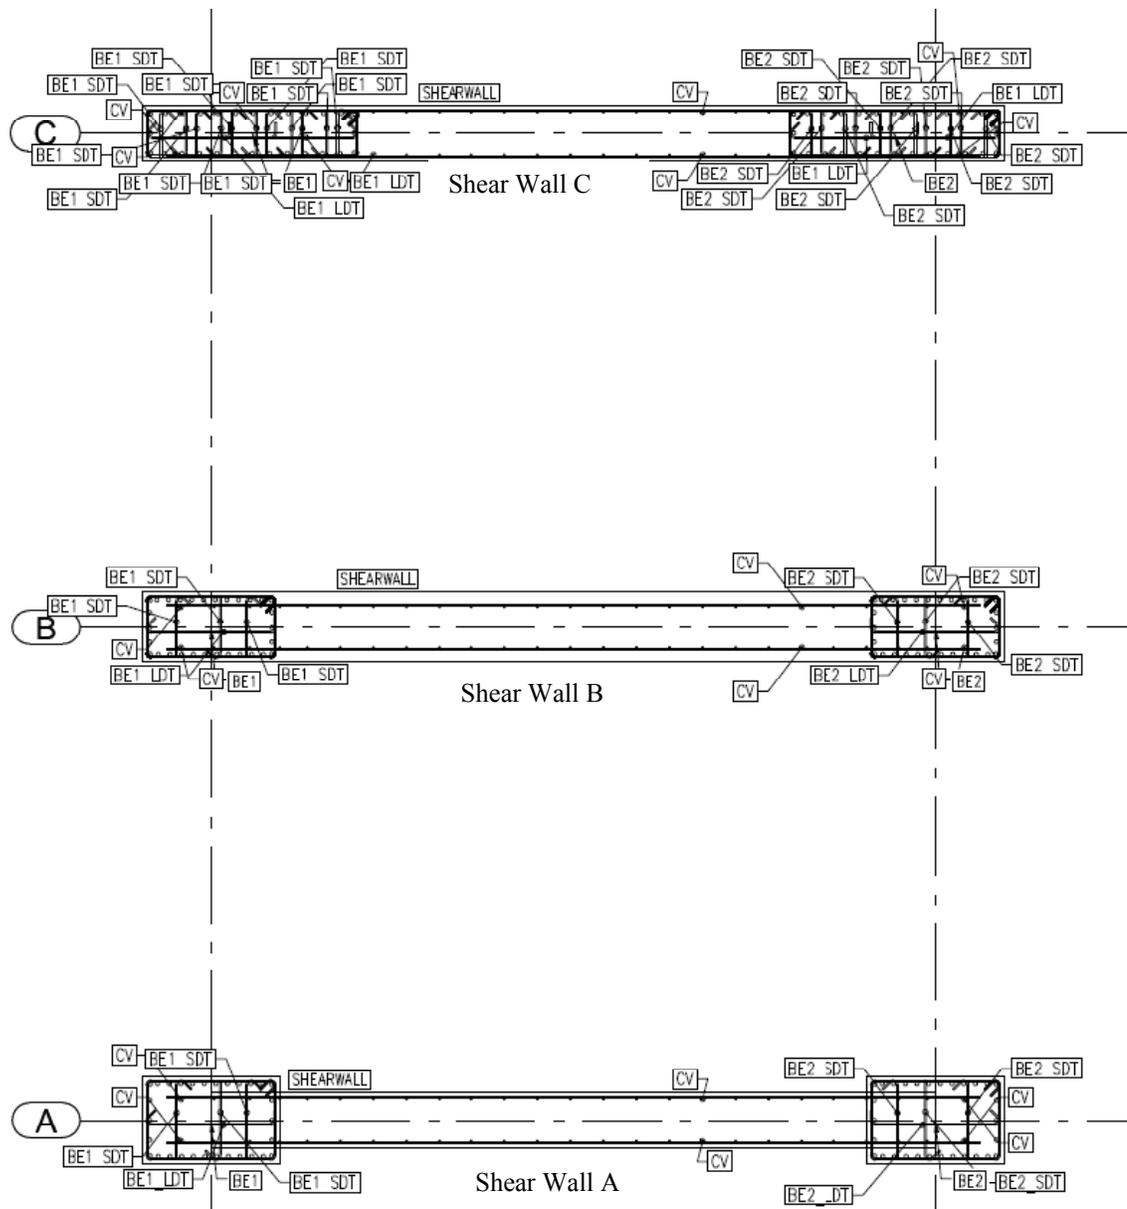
Set of shear wall alternatives, with rebar named as objects for SetPlan
